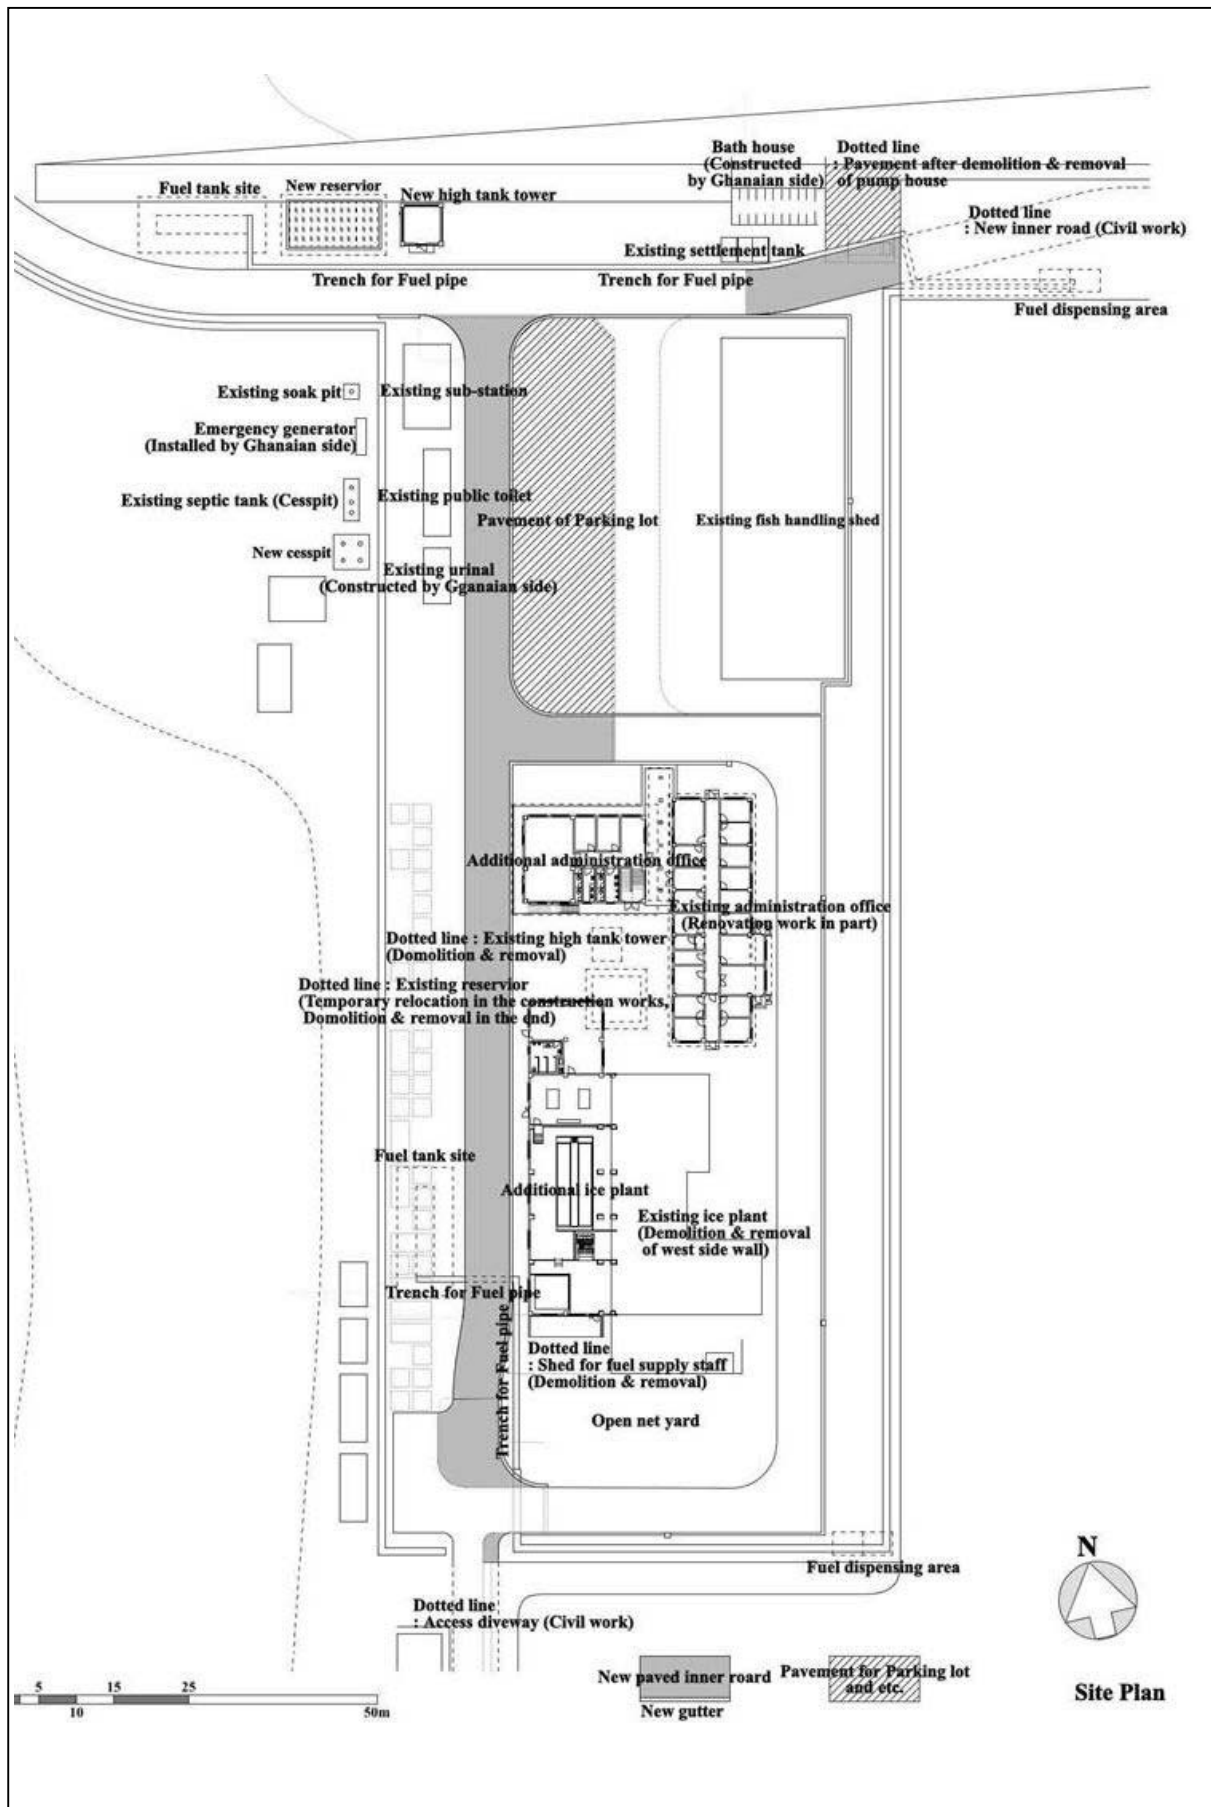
(6) Layout Plan of Land Facilities
